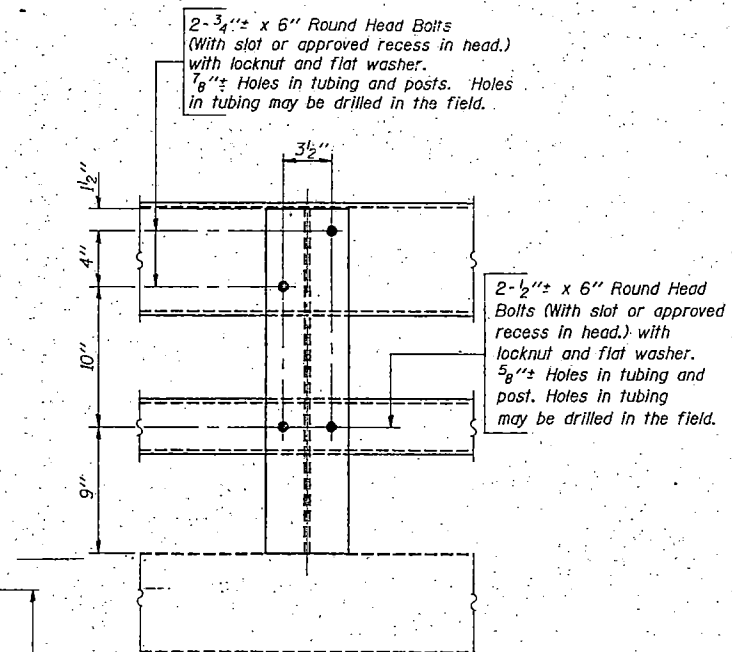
DETAIL OF STEEL BRIDGE RAIL SPECIAL
